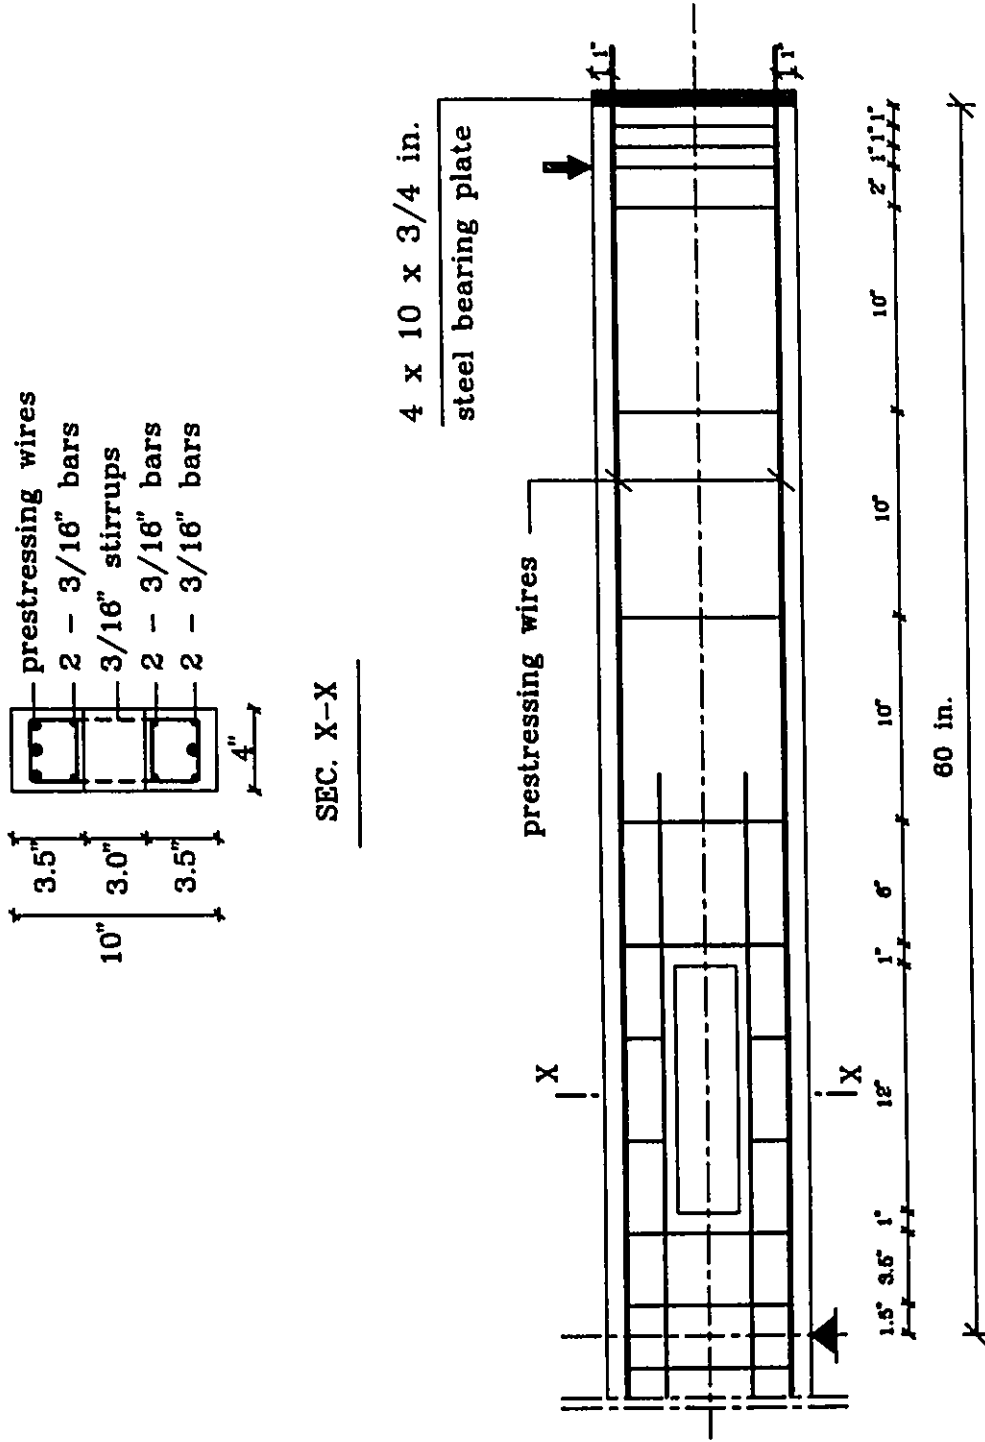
REINFORCEMENT DETAILS FOR BEAM BI1A
